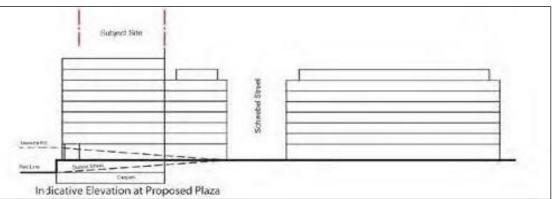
Proposed height limits adjacent Marrickville Railway Station (Peer Review of Planning Proposal, 2-18 Station Street and 1 Leofrene Avenue, Marrickville, Architectus, 30 December 2013).
